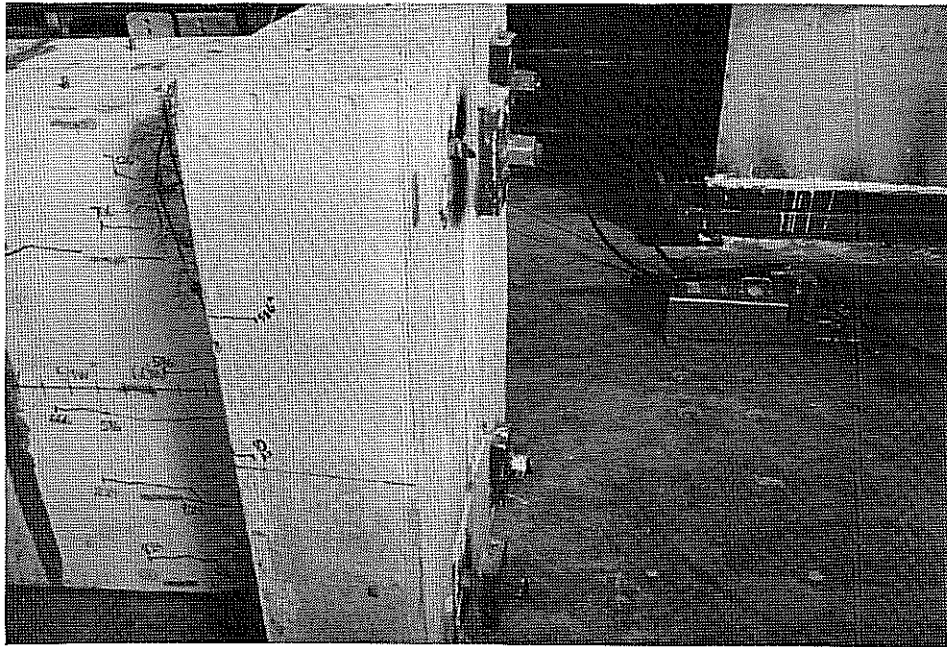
Specimen 6S16 Post-Tensioning Anchorages
